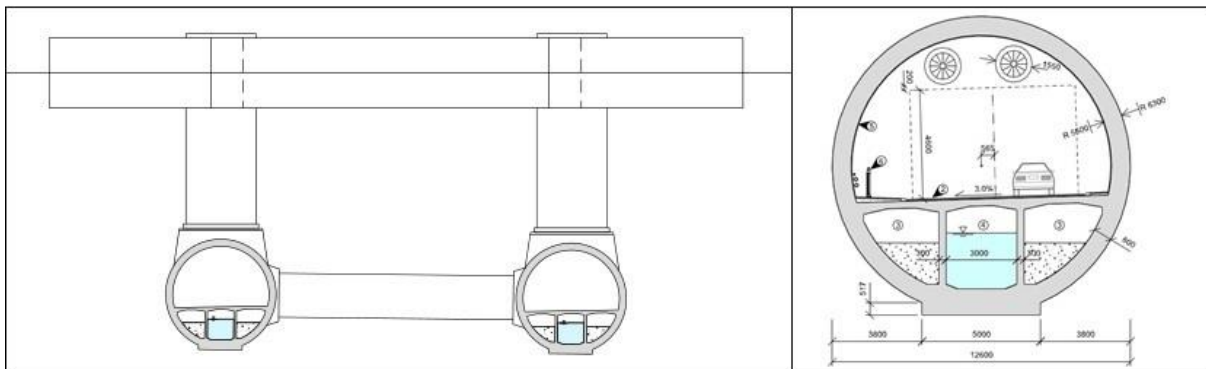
Cross section of the tube system illustrating the width of the construction, and design of the tubes with ballast chambers.
